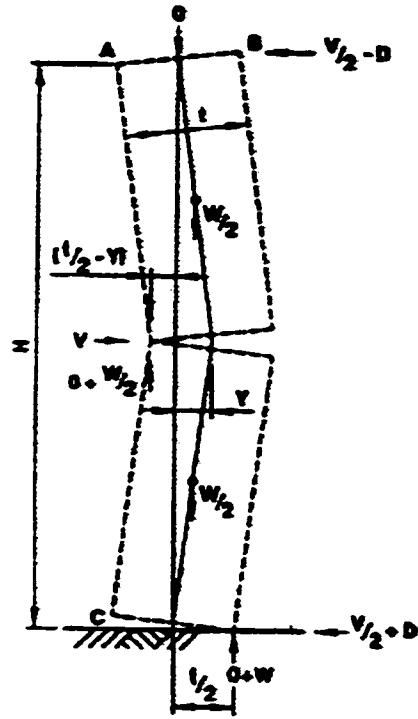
Face loaded wall under static loading (Blaikie and Davey 2000).
